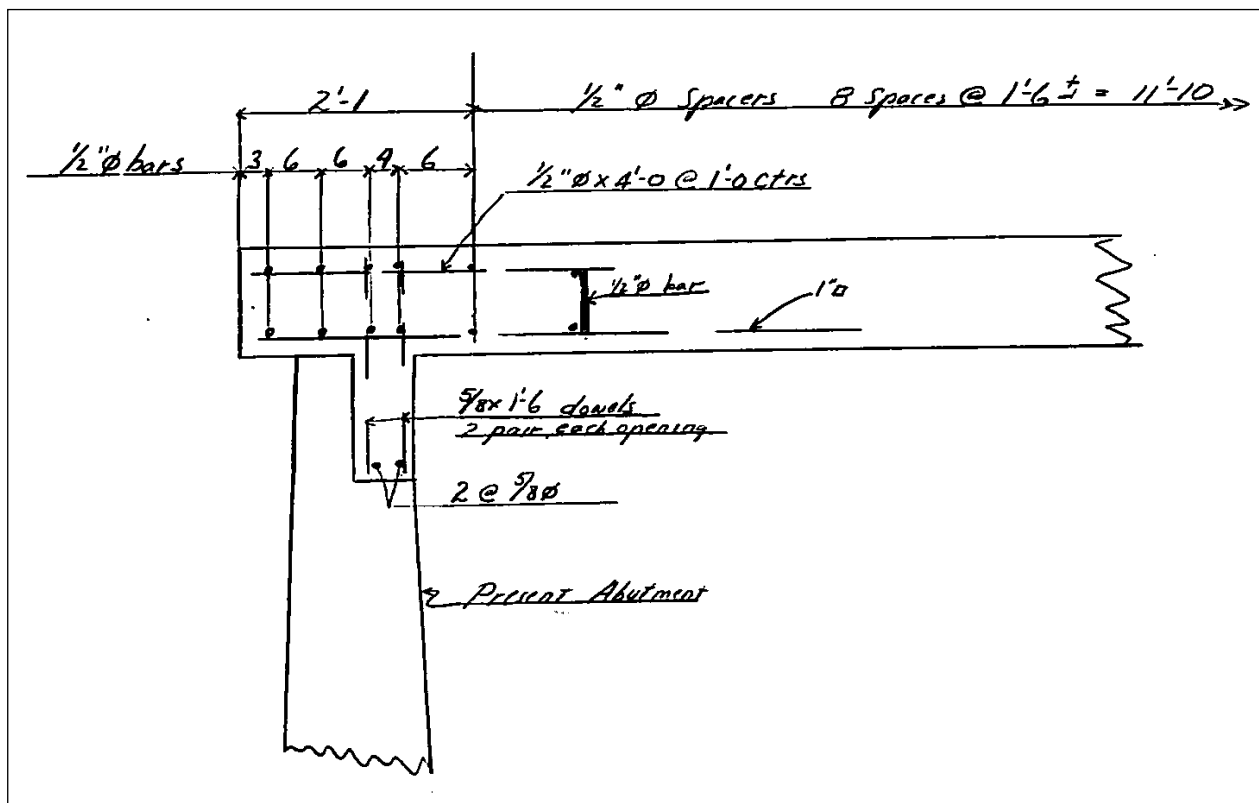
Cross section of abutment in 1940 rehabilitation plan. Notice a footing extending down from the slab to meet the existing abutment seat.¹²
